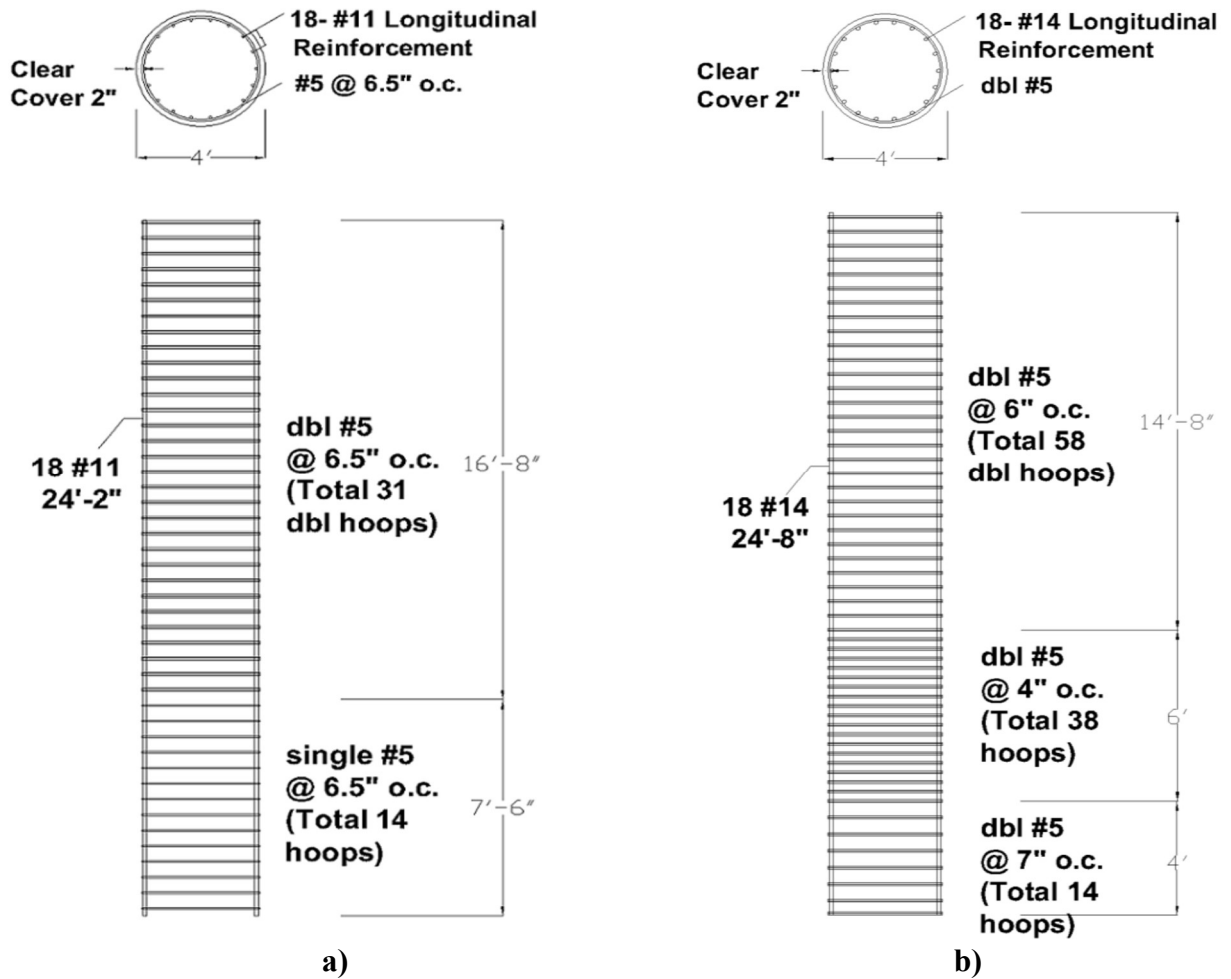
Liu (2012) Column Reinforcement Cages: a) Specimen 1 and b) Specimen 2
